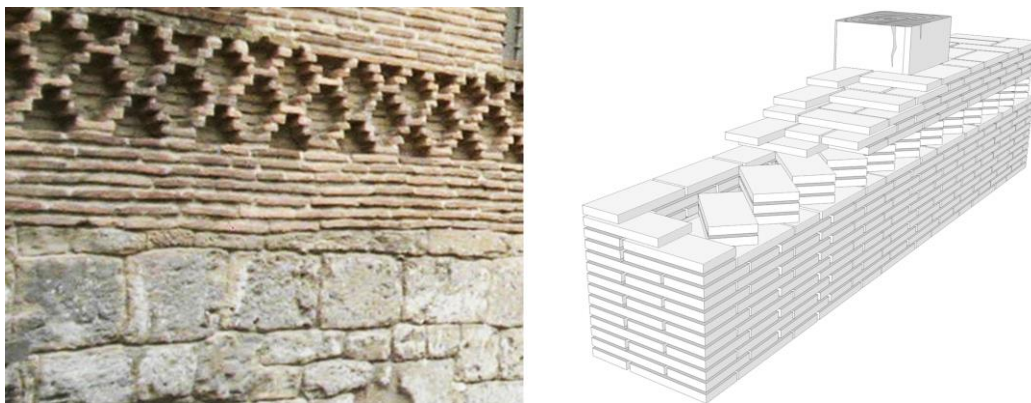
Left: Seating of the brick masonry on the stone walls (Photo: Daniel Luengas-Carreño). Right: Sawtooth brickwork and joint of the interior and exterior layers of brick
